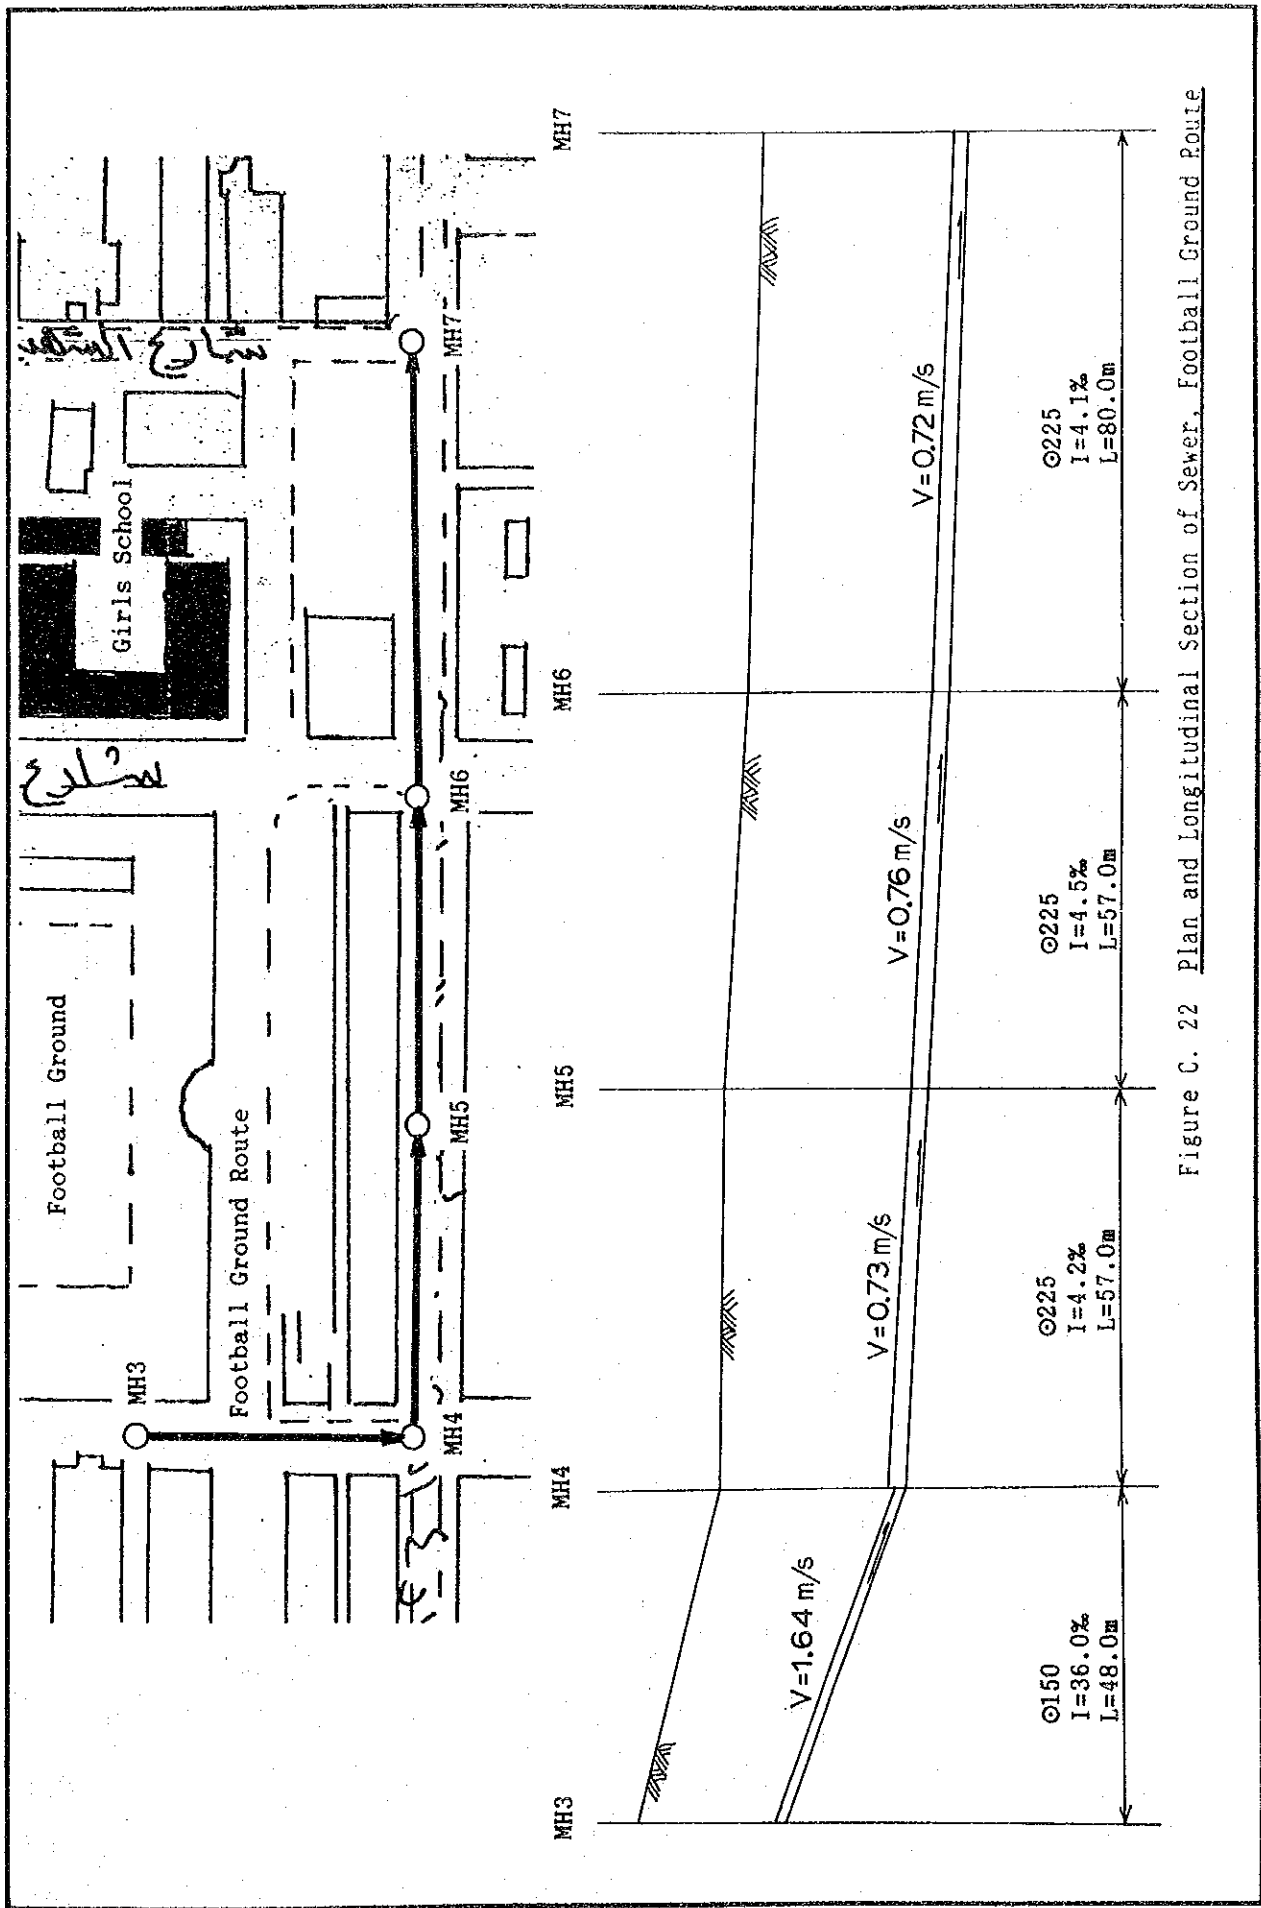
Plan and Longitudinal Section of Sewer, Football Ground Route
